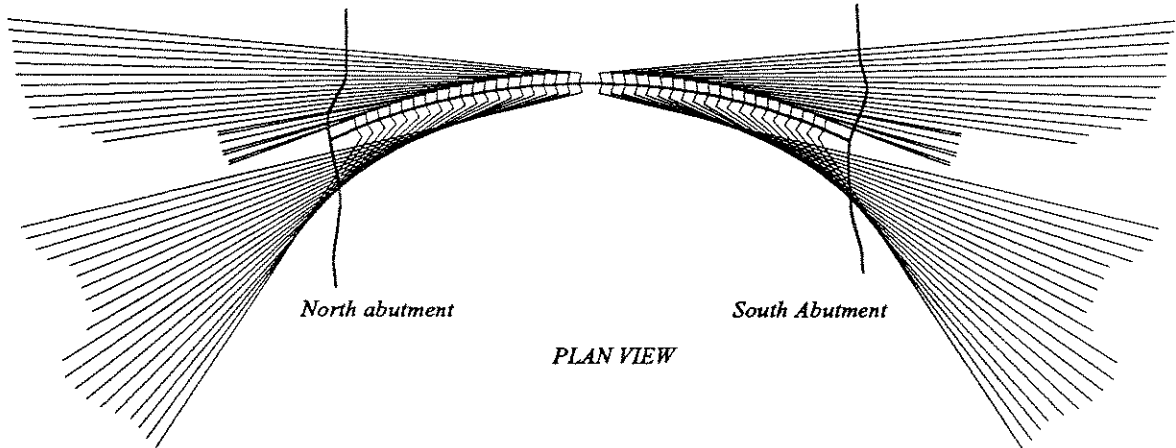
LAYOUT AND GEOMETRY; RUCK-A-CHUCKY CONCRETE BRIDGE
